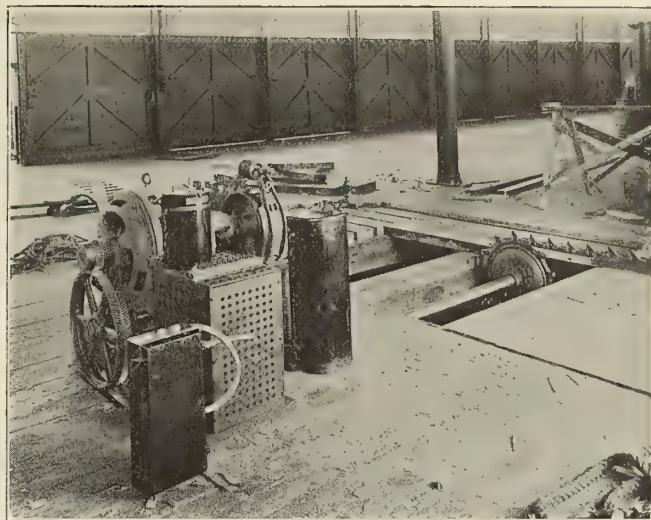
Motor, Controller and Reduction Gearing of Otis Inclined Elevator
